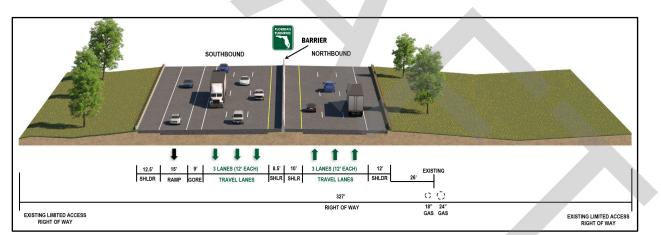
(a) – Existing Roadway Section of Florida's Turnpike between Wiles Road and Sawgrass Expressway
